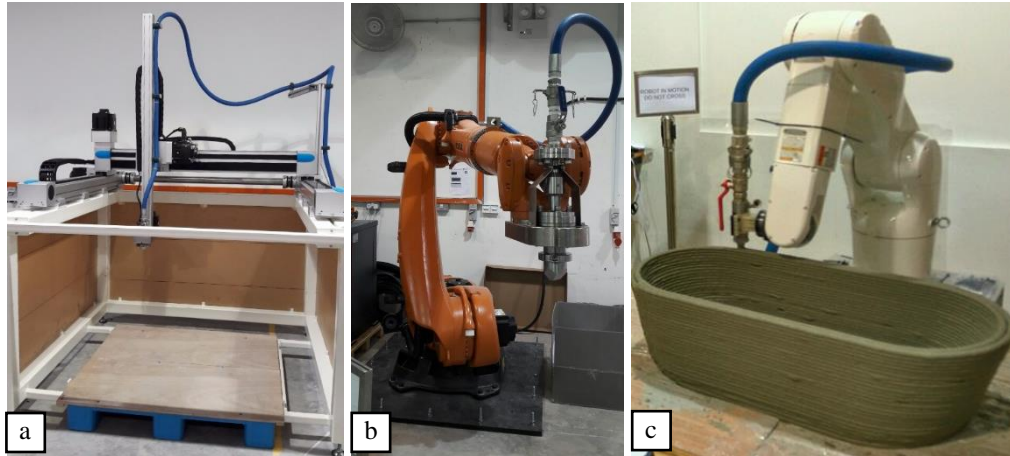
3D concrete printers at SC3DP (a) gantry printer with a rotating nozzle (b) robotic printer with a rotating nozzle (c) six-axis robotic printer printing a miniature bathtub.
